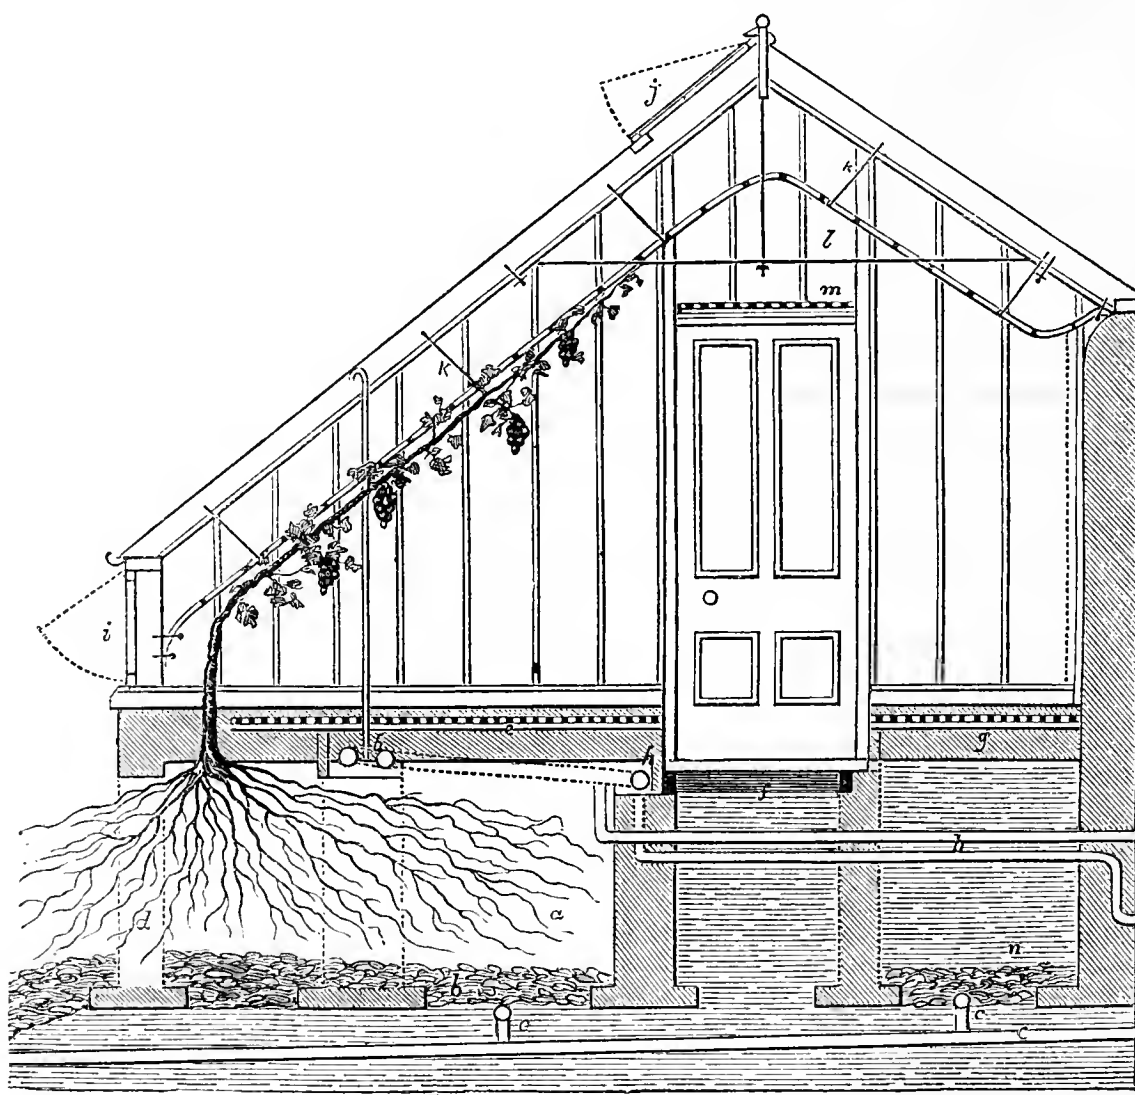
HALF-SPAN HOUSE, SECTION AND END ELEVATION.
